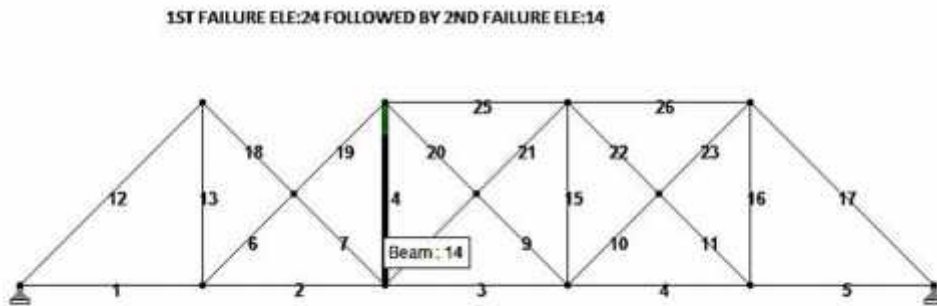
Geometrical configuration of the truss after failure of first element having minimum RI i.e element no 24
